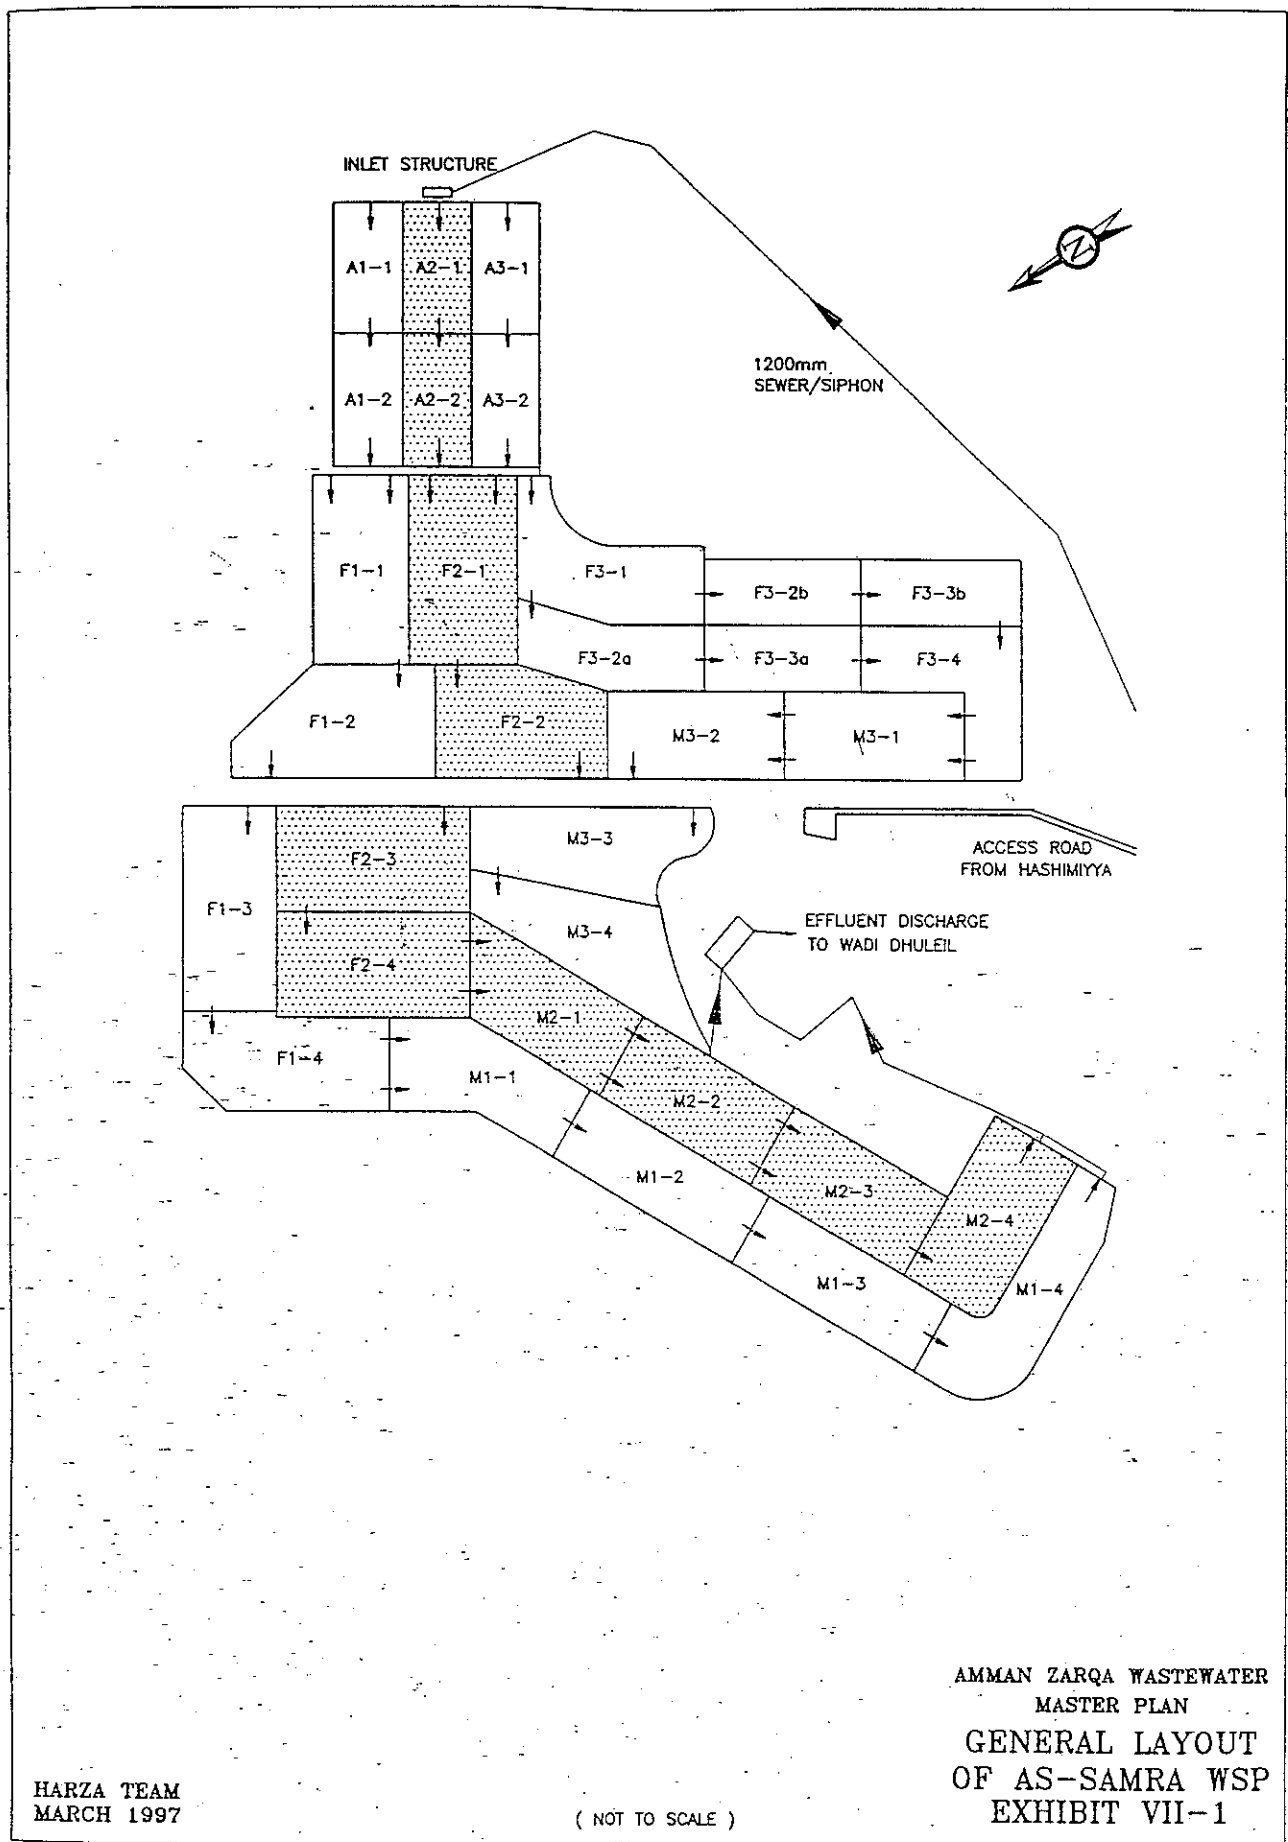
Schematic Layout of Existing Wastewater Treatment Plant - AS SAMRA
